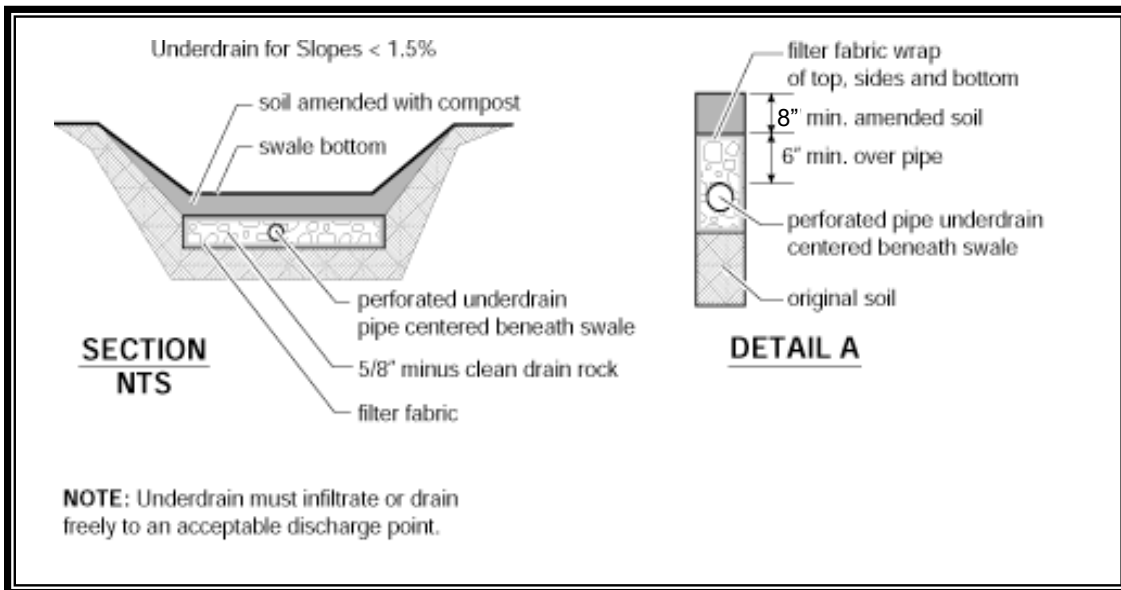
Biofiltration Swale Underdrain Detail
